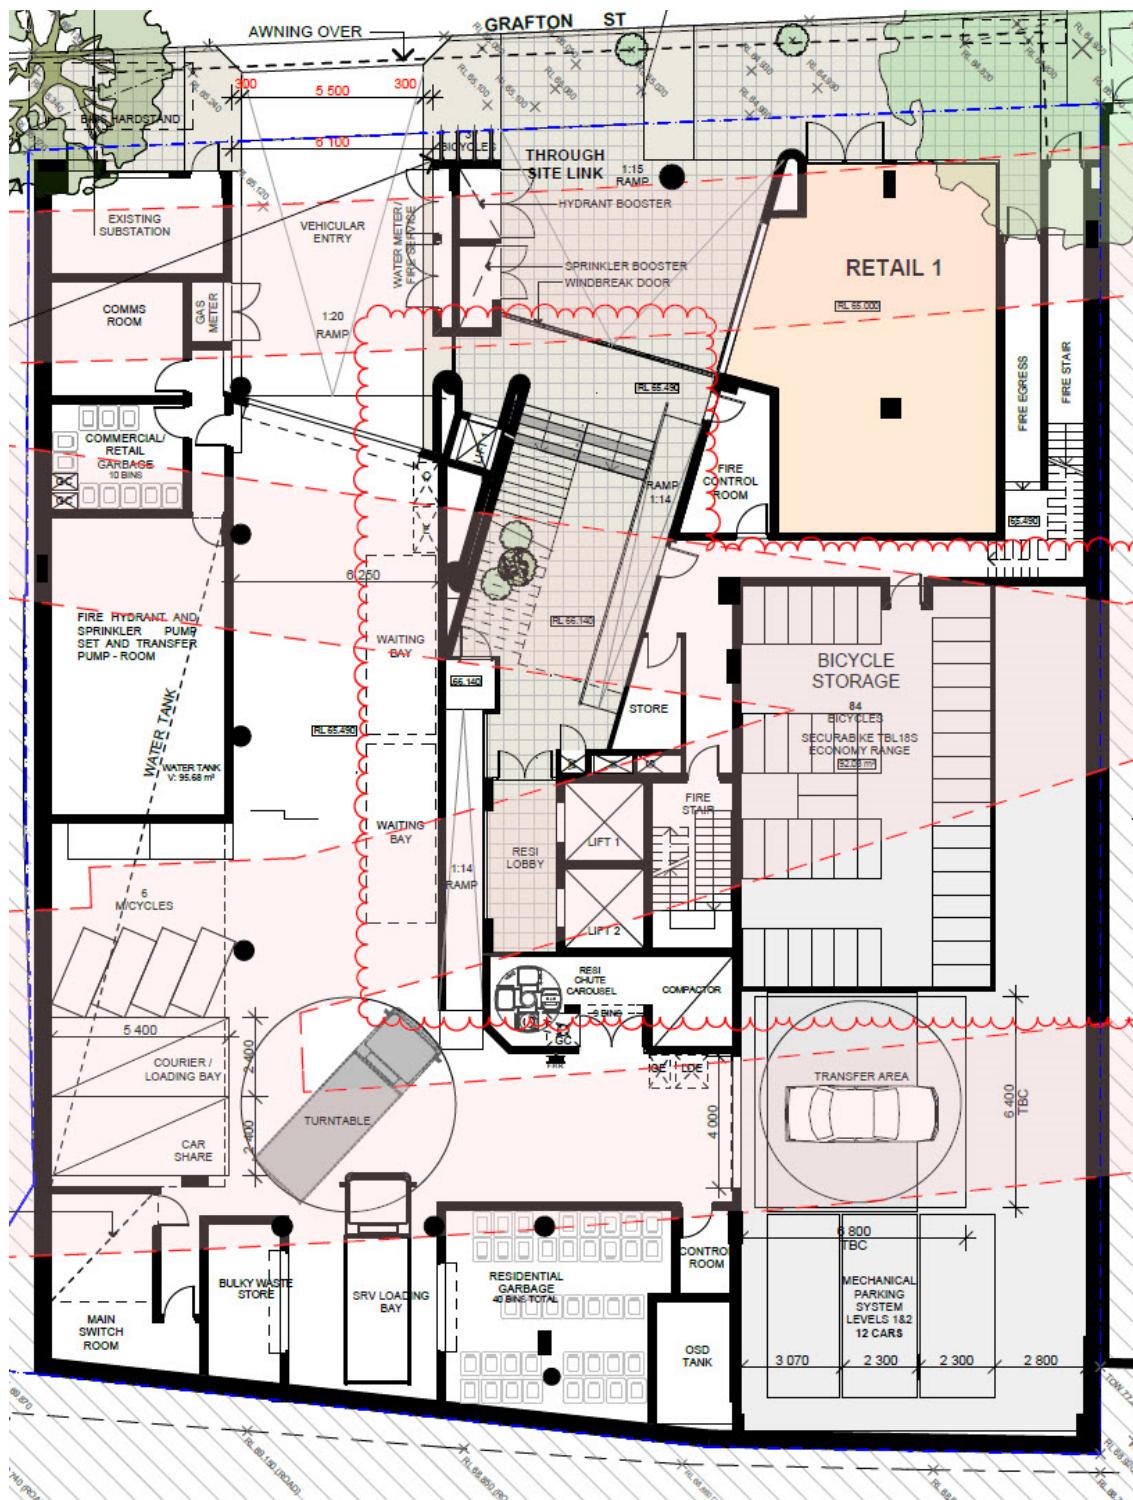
Amended Lower Ground Floor Plan (Source: Cottee Parker JPRA, DA 2100_D)
